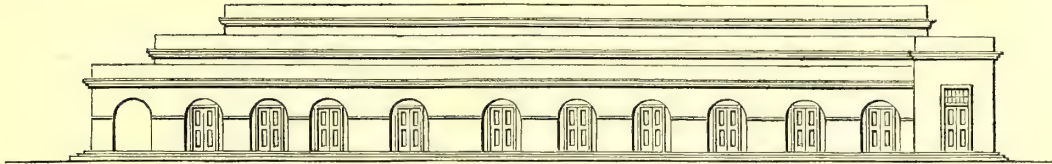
gives a plan, elevation, and section of the new barrack, either erected or about to be erected, at Mhow. The elevation shows a magnificent and costly structure. But it is on two floors; it has double verandahs, the inner ones occupied by beds, so that there are four rows of beds, and 53 feet between the opposite windows; the ventilation of the whole interior is interrupted in rather an ingenious way by cross walls, and the men have 65 square feet of space each.
